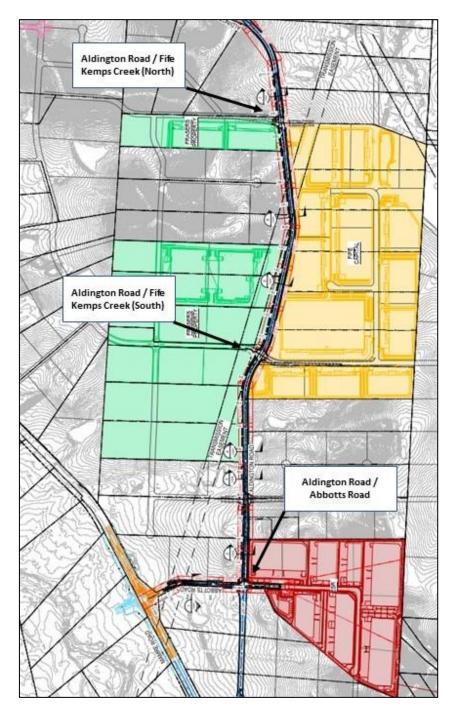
Intersections along Aldington Road Source: AT&L Drawing No. 21-843-C502
